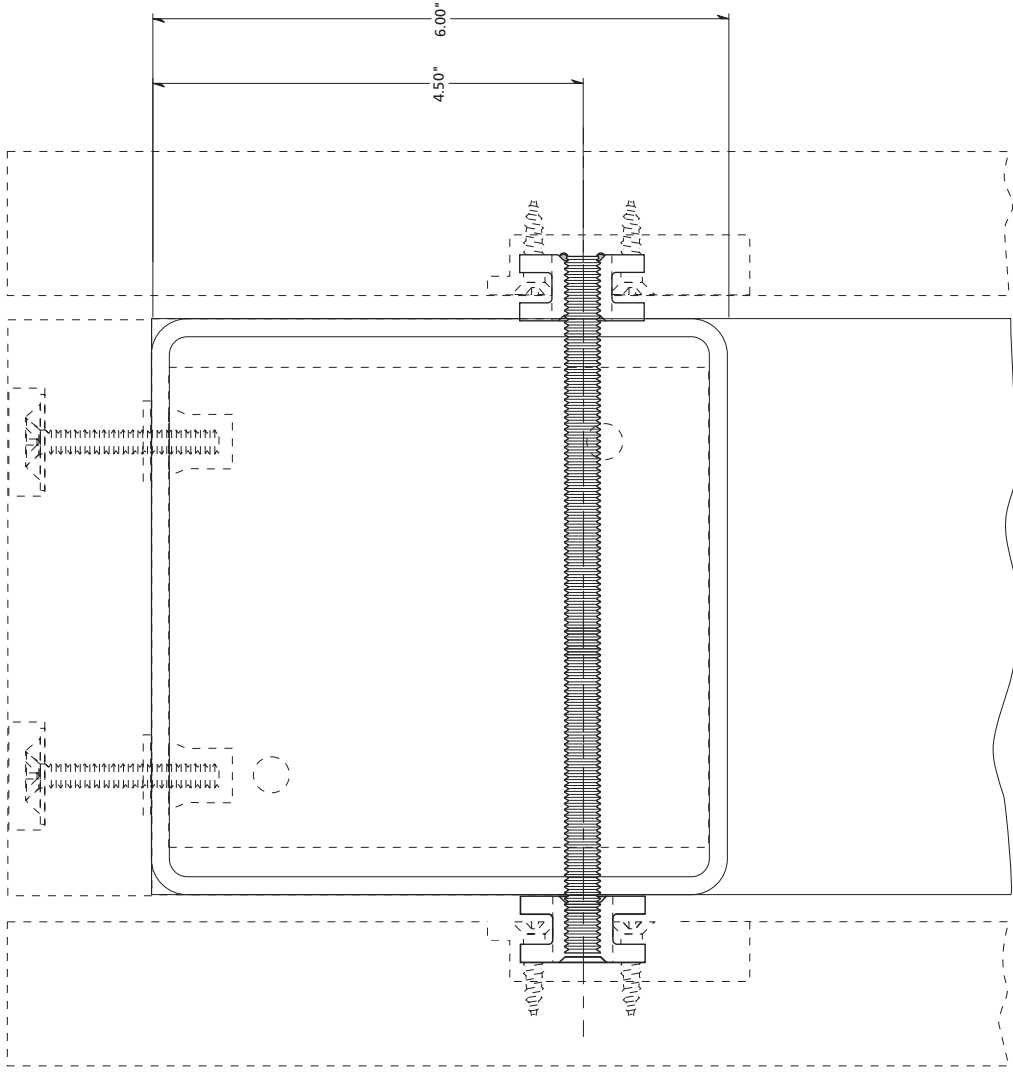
" x 6" RAIL PLUG FRONT ELEVATION
